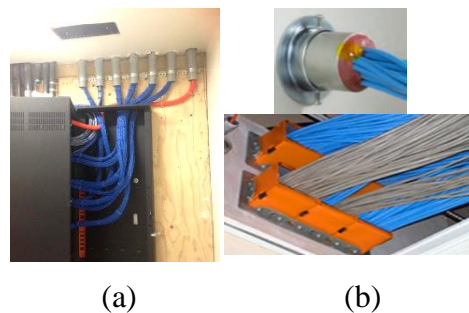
Intra-building backbone cables (a -Vertical conduits) (b - Guarded CB)
